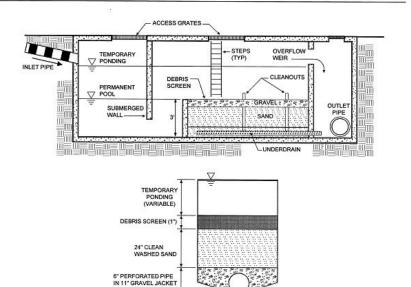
Schematic of Underground Sand Filter (Source: Center for Watershed Protection
